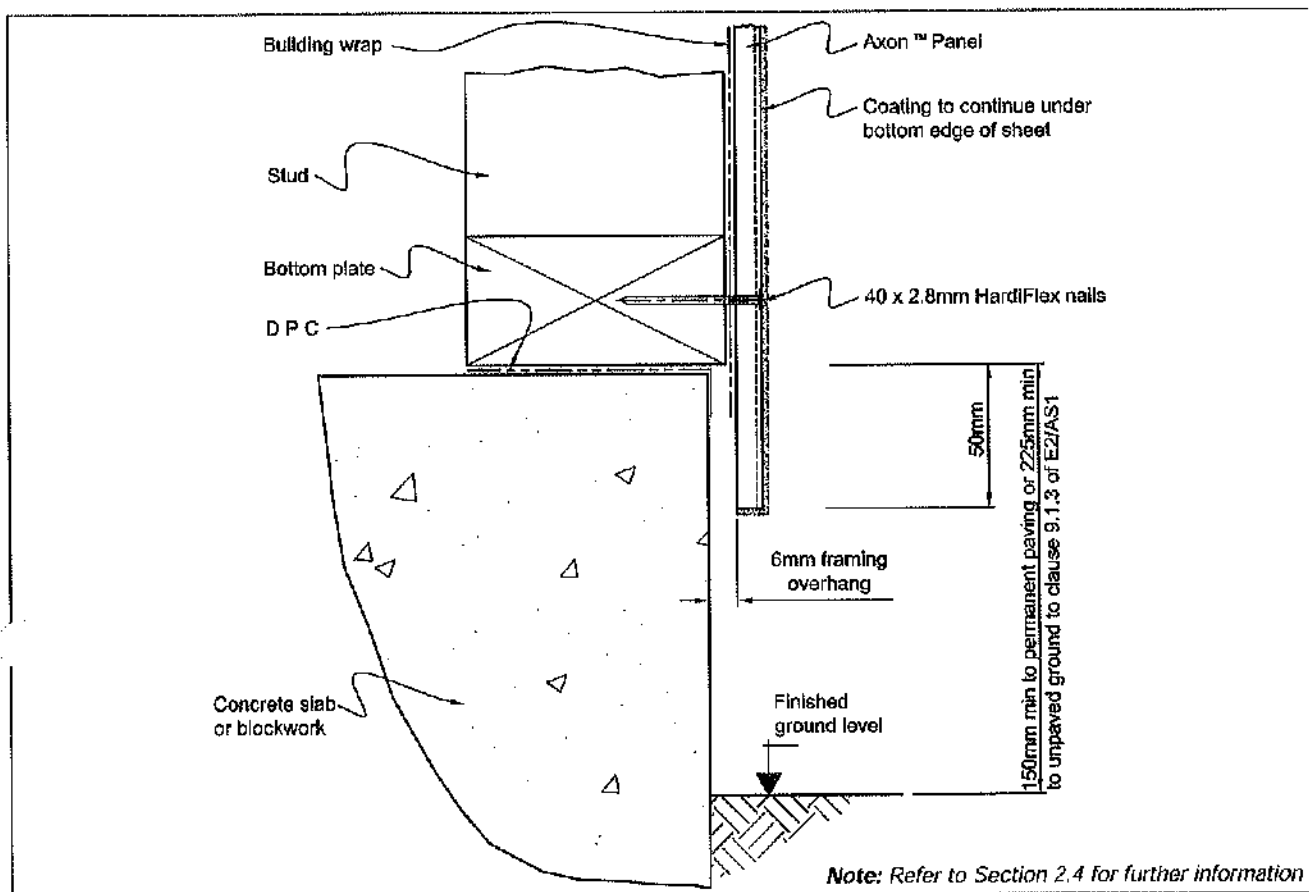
DIRECT FIXED FOUNDATION DETAIL
